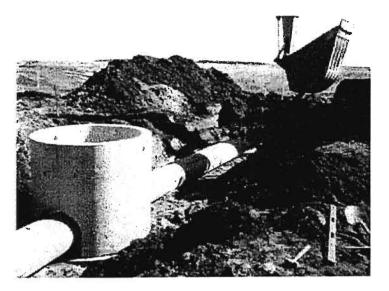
Installation of secondary outlet at Station 0+50 of dike alignment.
